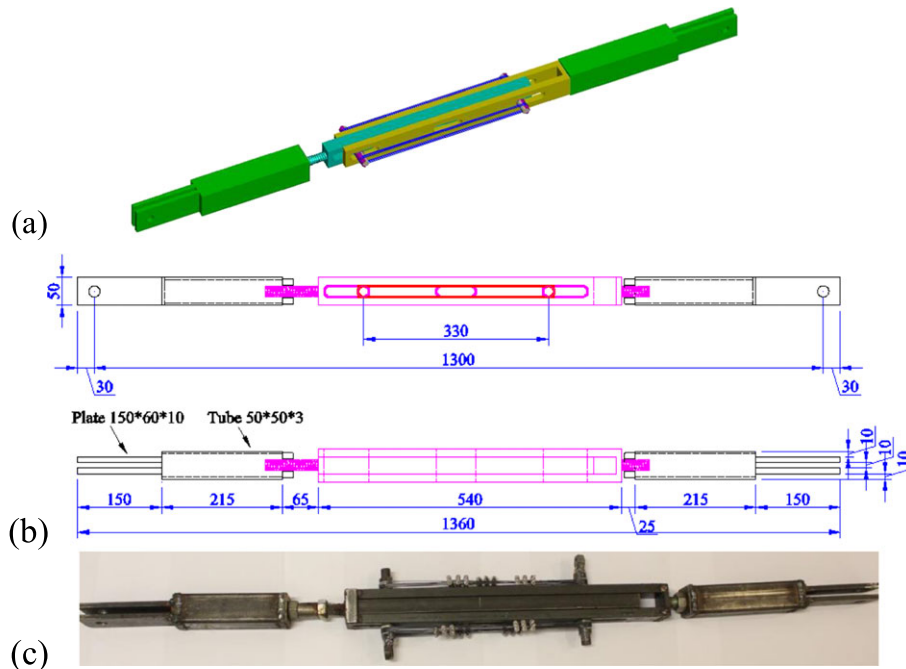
SMA brace (SMAB): (a) schematic view, (b) dimensions (unit: mm), and (c) photo of the tested brace.
